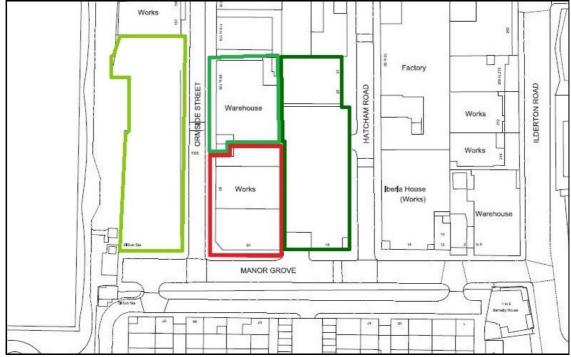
Plan showing the site edged in red. Edged in dark green is no.18 Manor Grove; in mid-green is no. 96-108 Ormside Street; in light green is the site of the Hi-Lo Scaffolding Co.
